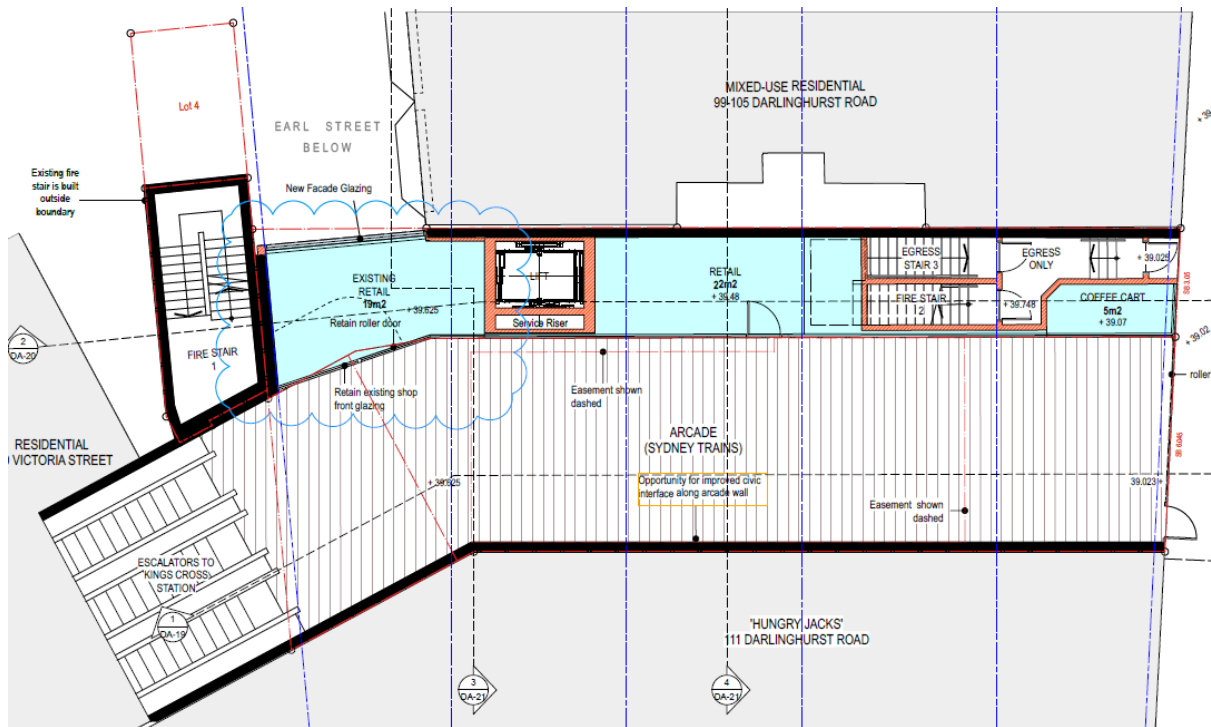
Proposed ground floor (Darlinghurst Road) plan
